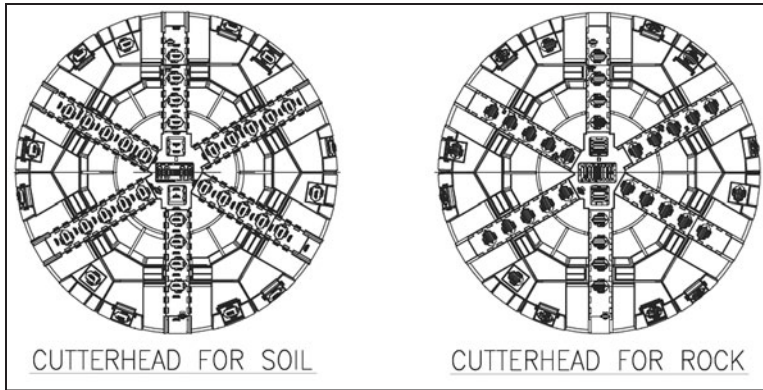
Cutterhead design with interchangeable cutting tools for soil and hard rock
